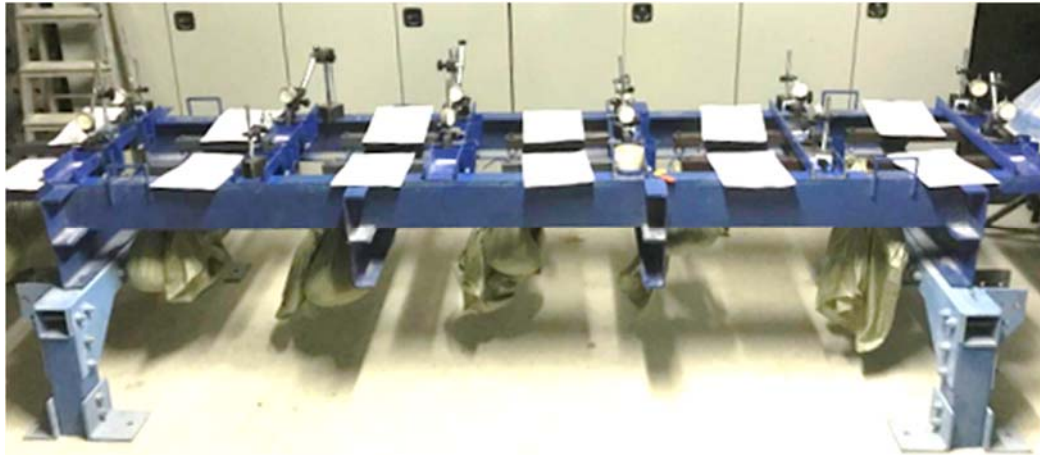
Lever-type test bench for studying the creep of composite sheet piles
